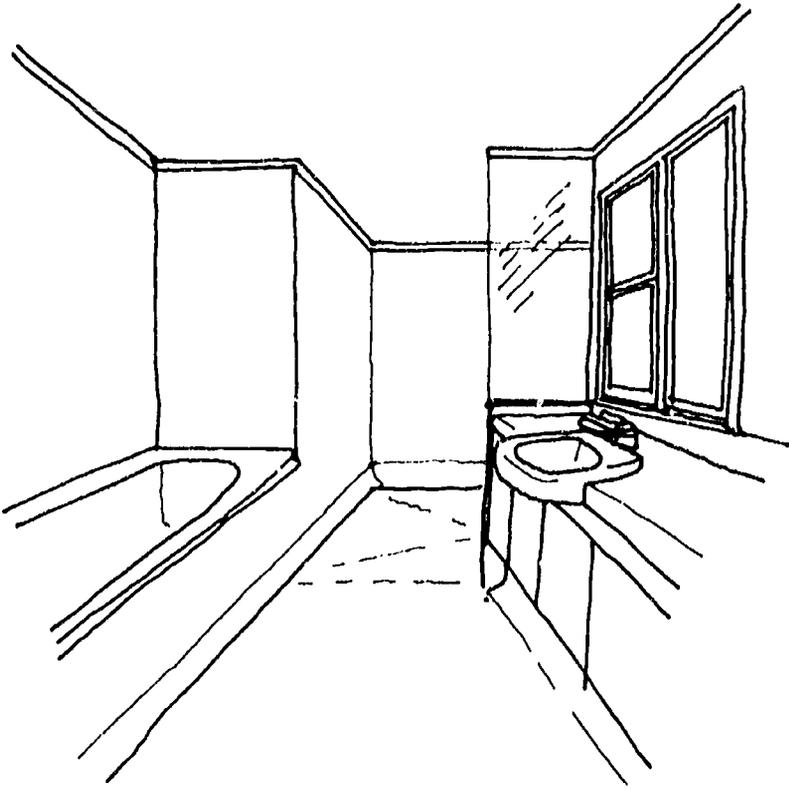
Bathroom layout to aid cleaning. NOTE: Cover vinyl, wet-area-shower can be easily squeegee cleaned.
